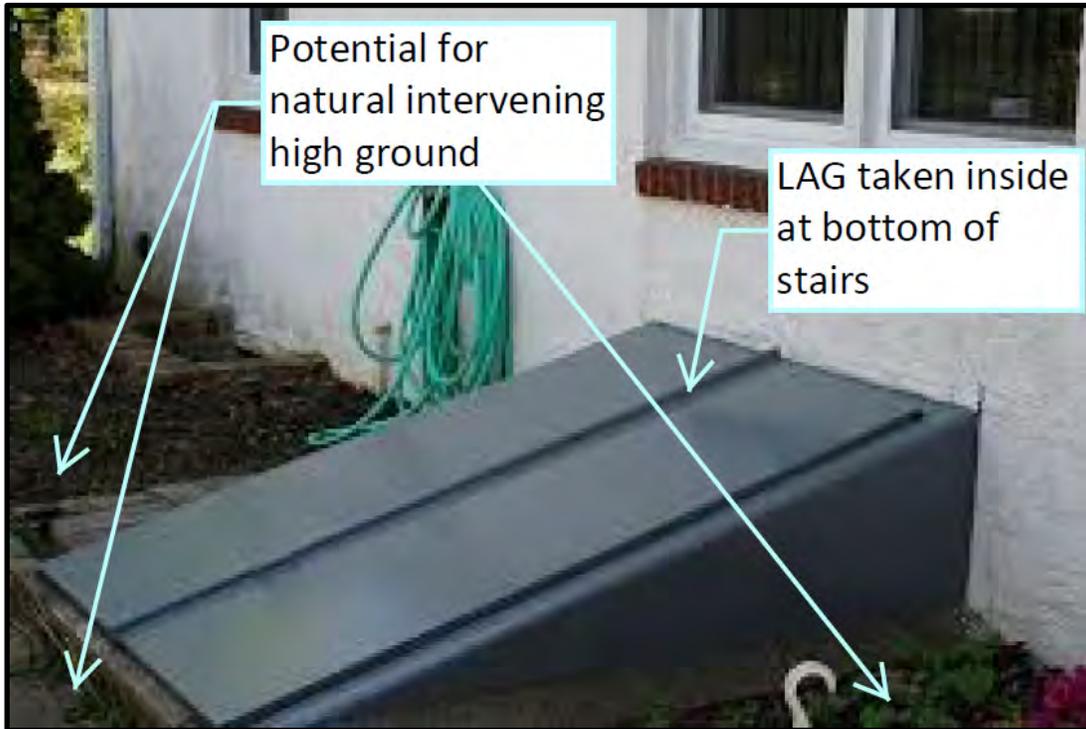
Use of Intervening High Ground – Covered Basement Stairs
